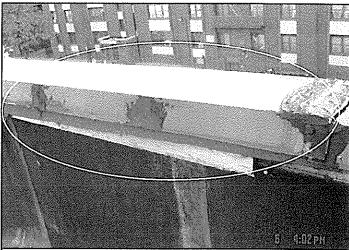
Facing east—large opening at aluminum cap joint for parapet.
